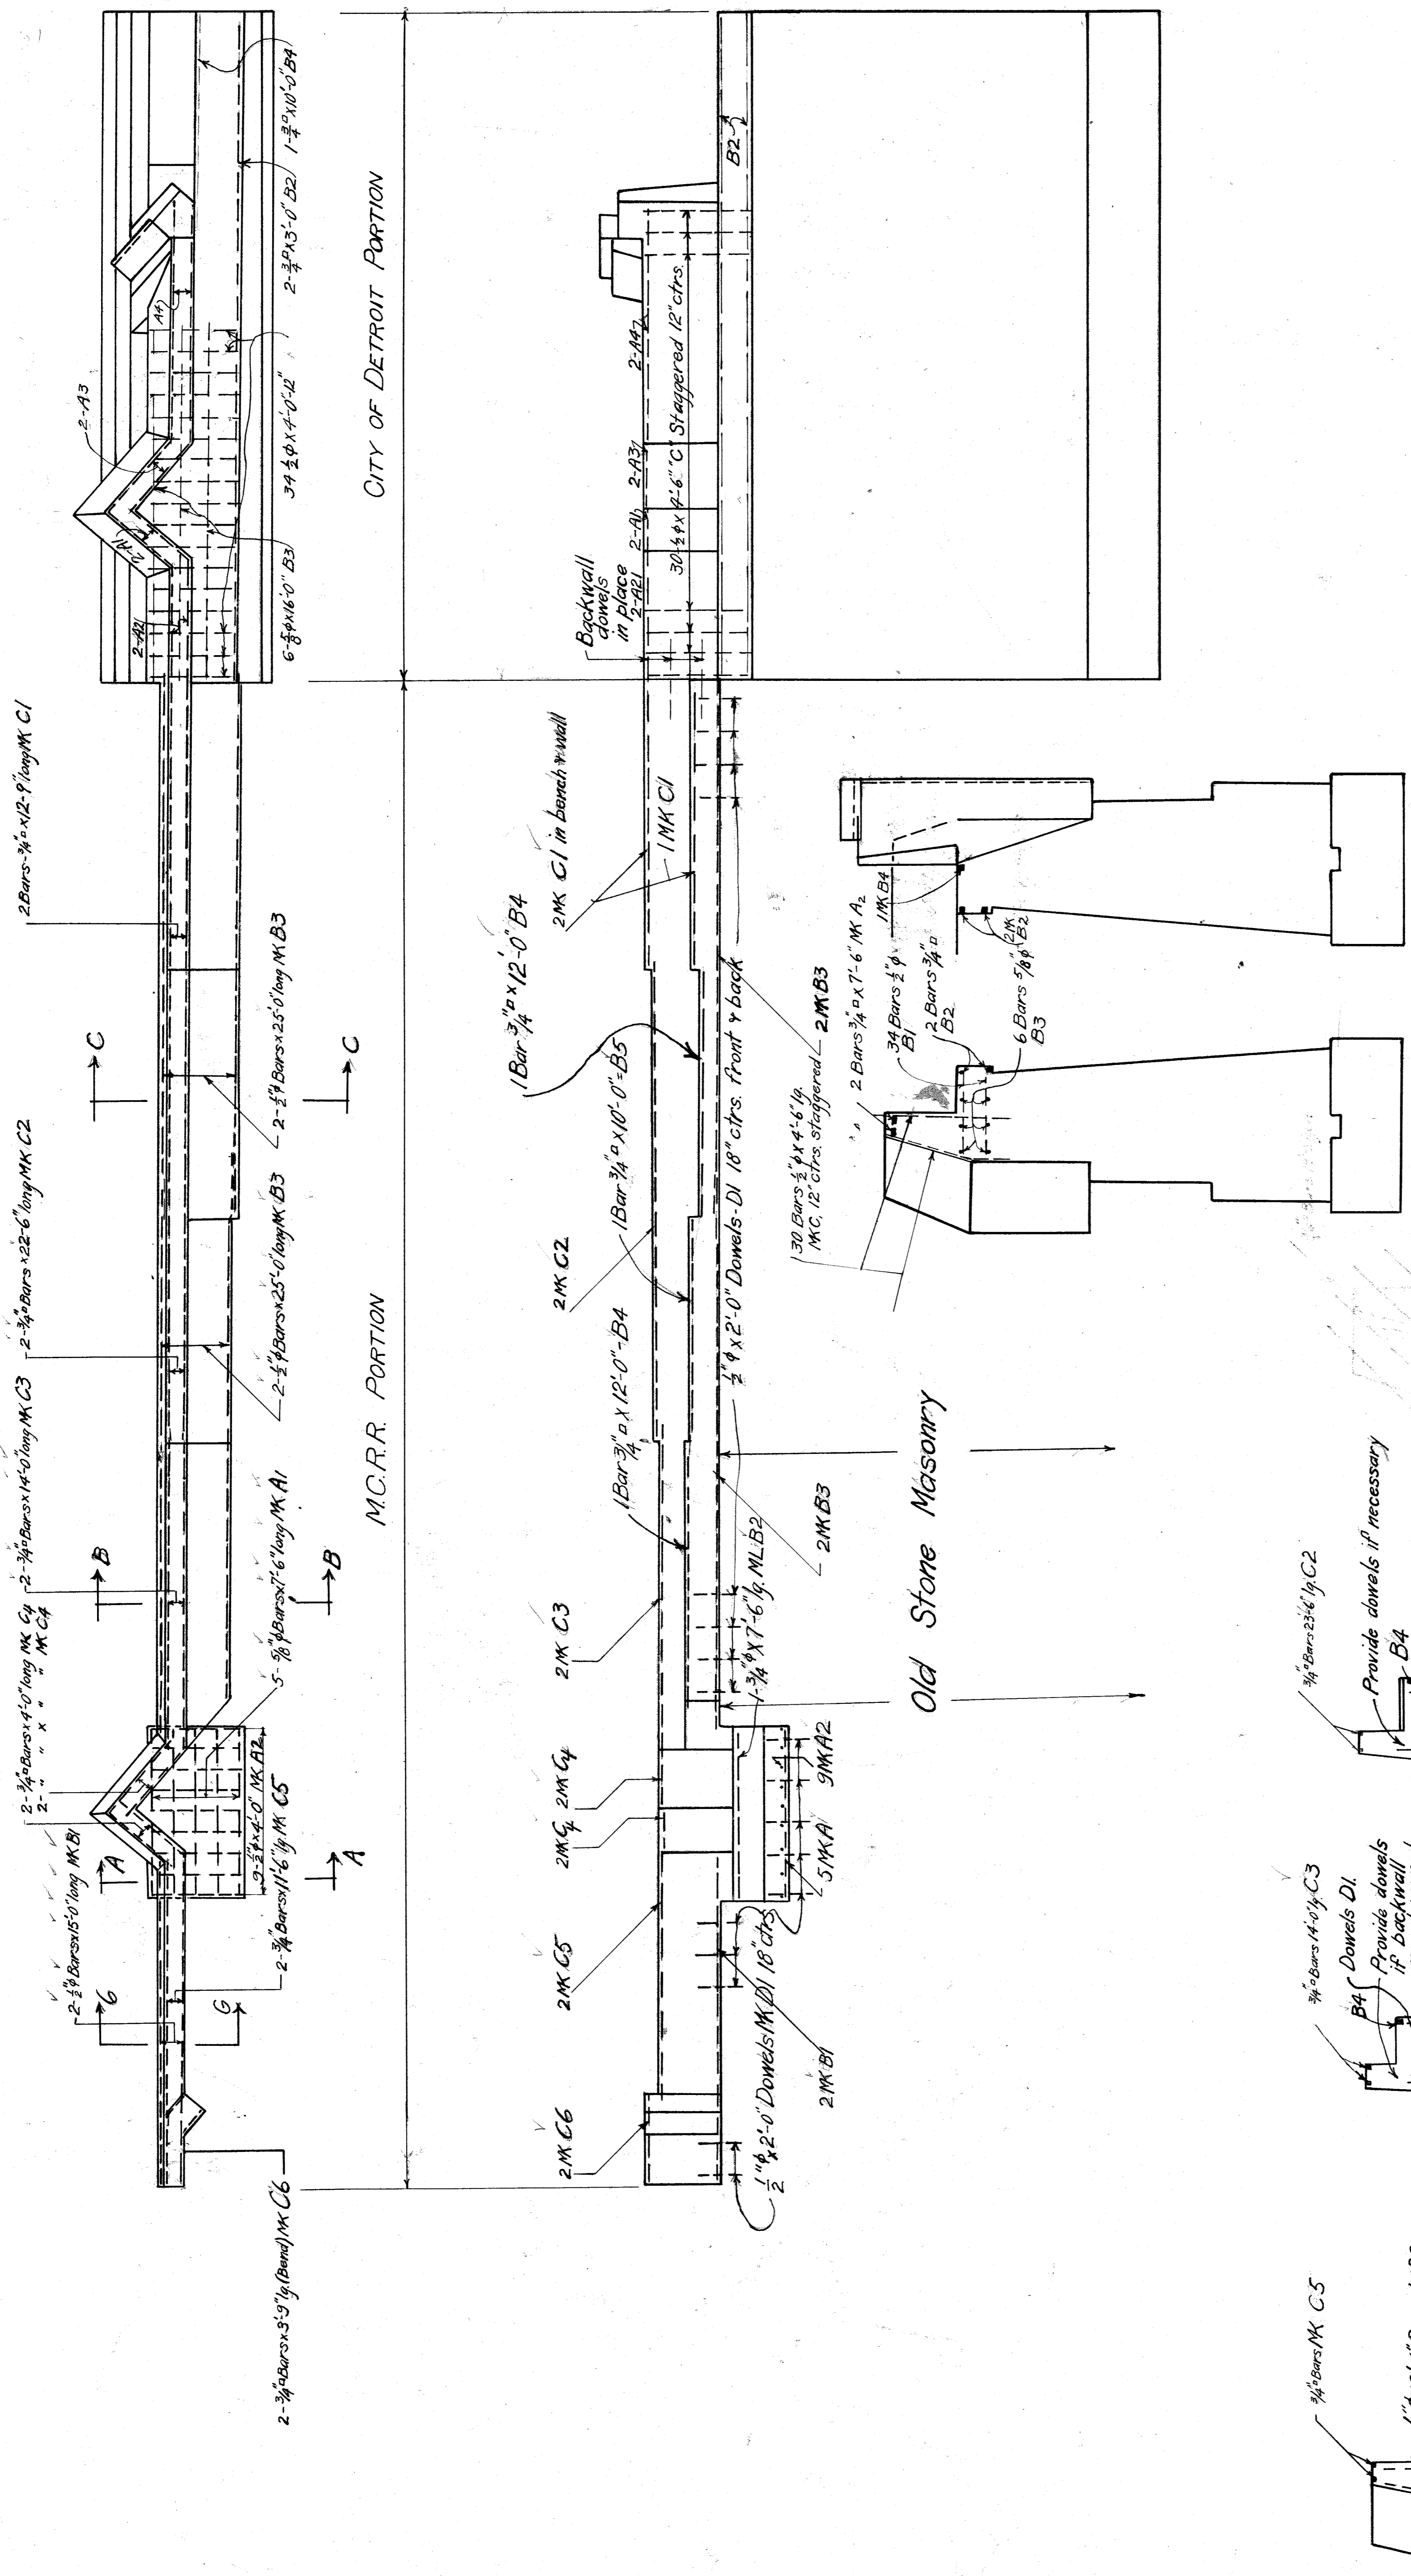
DETAILS OF ABUTMENT ENDS OF FLOOR BEAMS & STRINGERS AT FIXED END
